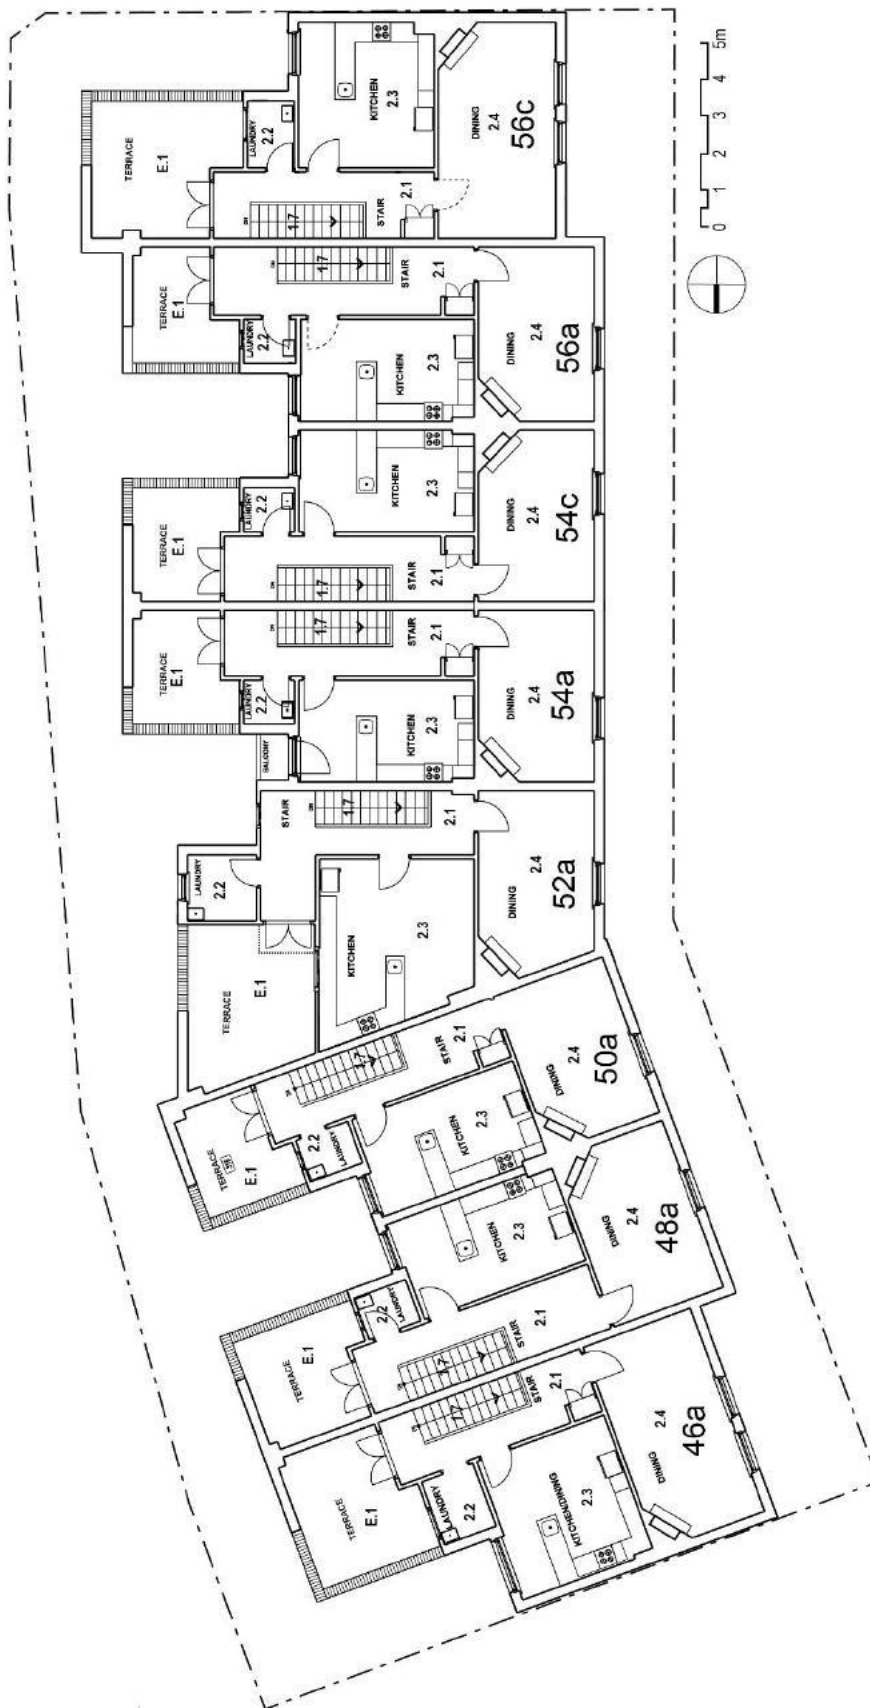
Second floor level plan. (Source: SHFA, amended by GML, 2016)
